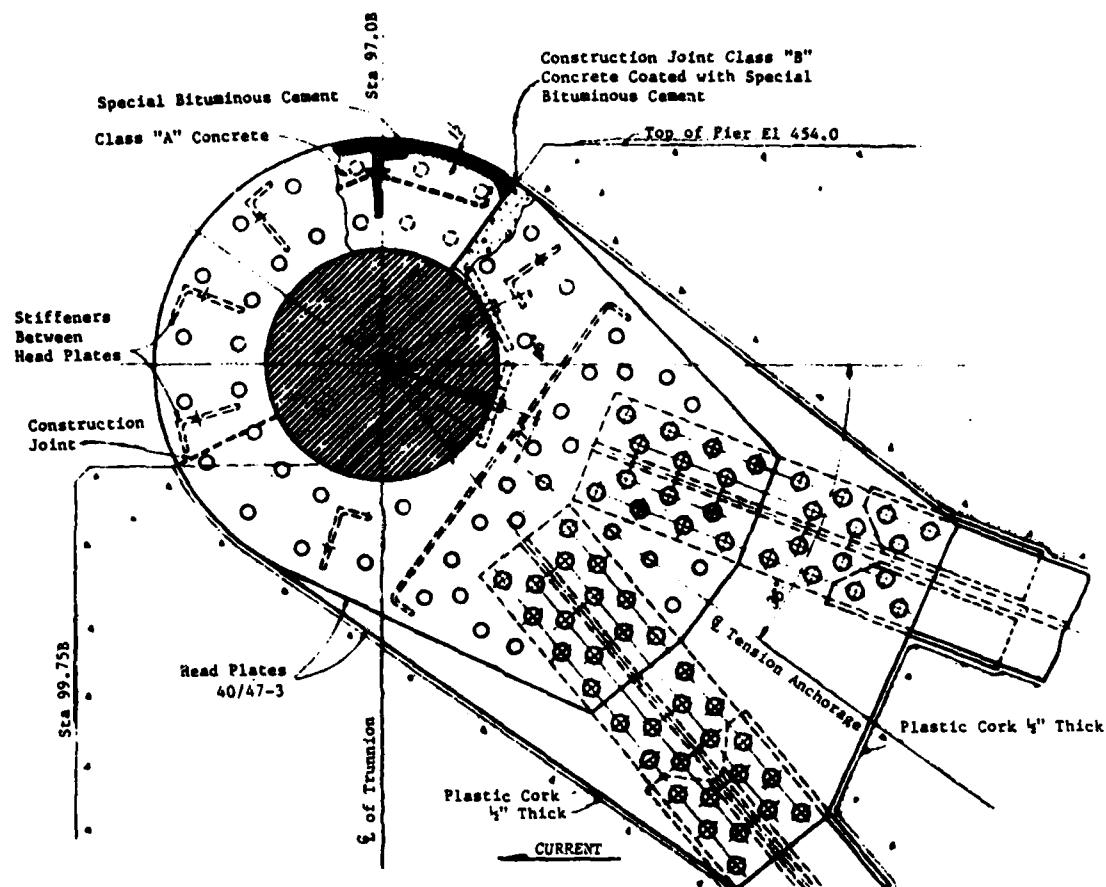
Detail of trunnion, head plates, and anchorage beam connections
